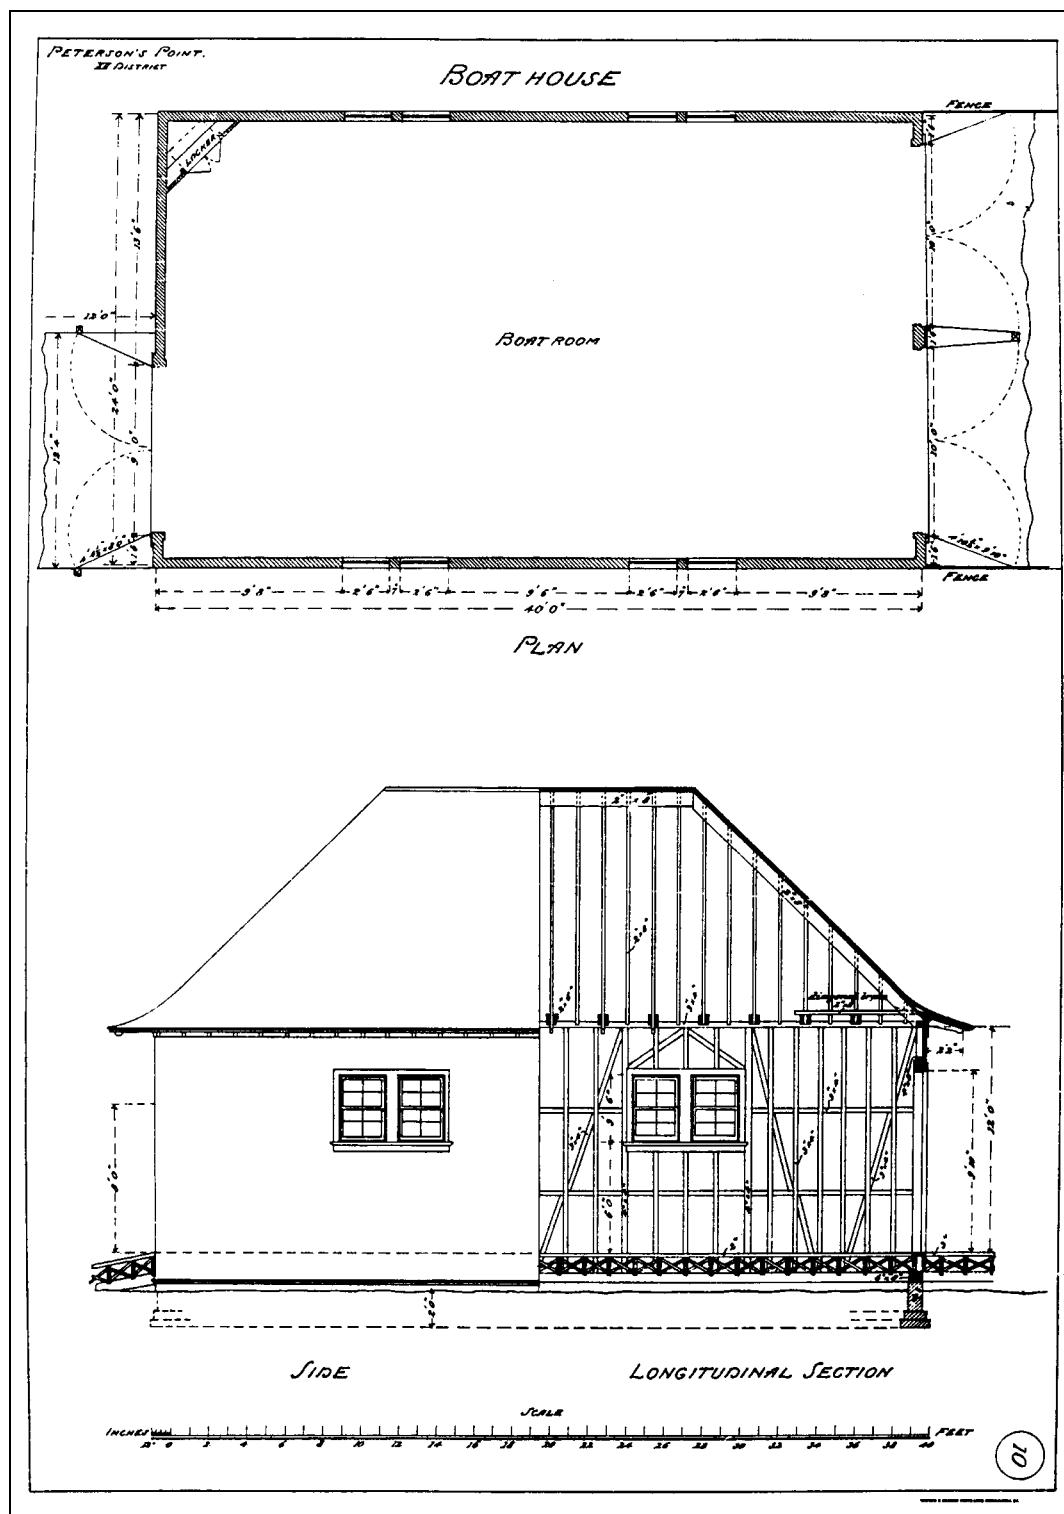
Plan and Section, Boathouse, Tillamook Bay Life-Saving Station.
